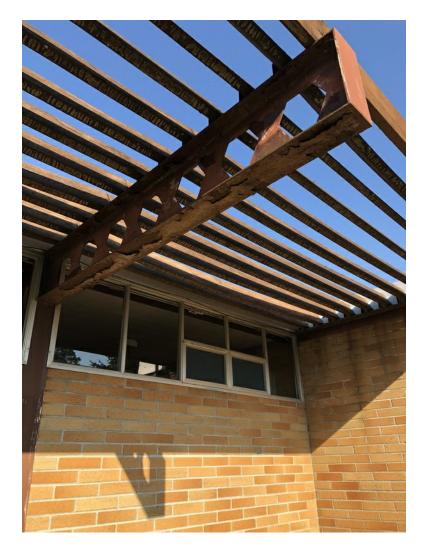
Corroded steel beam at northeast trellis overhang
